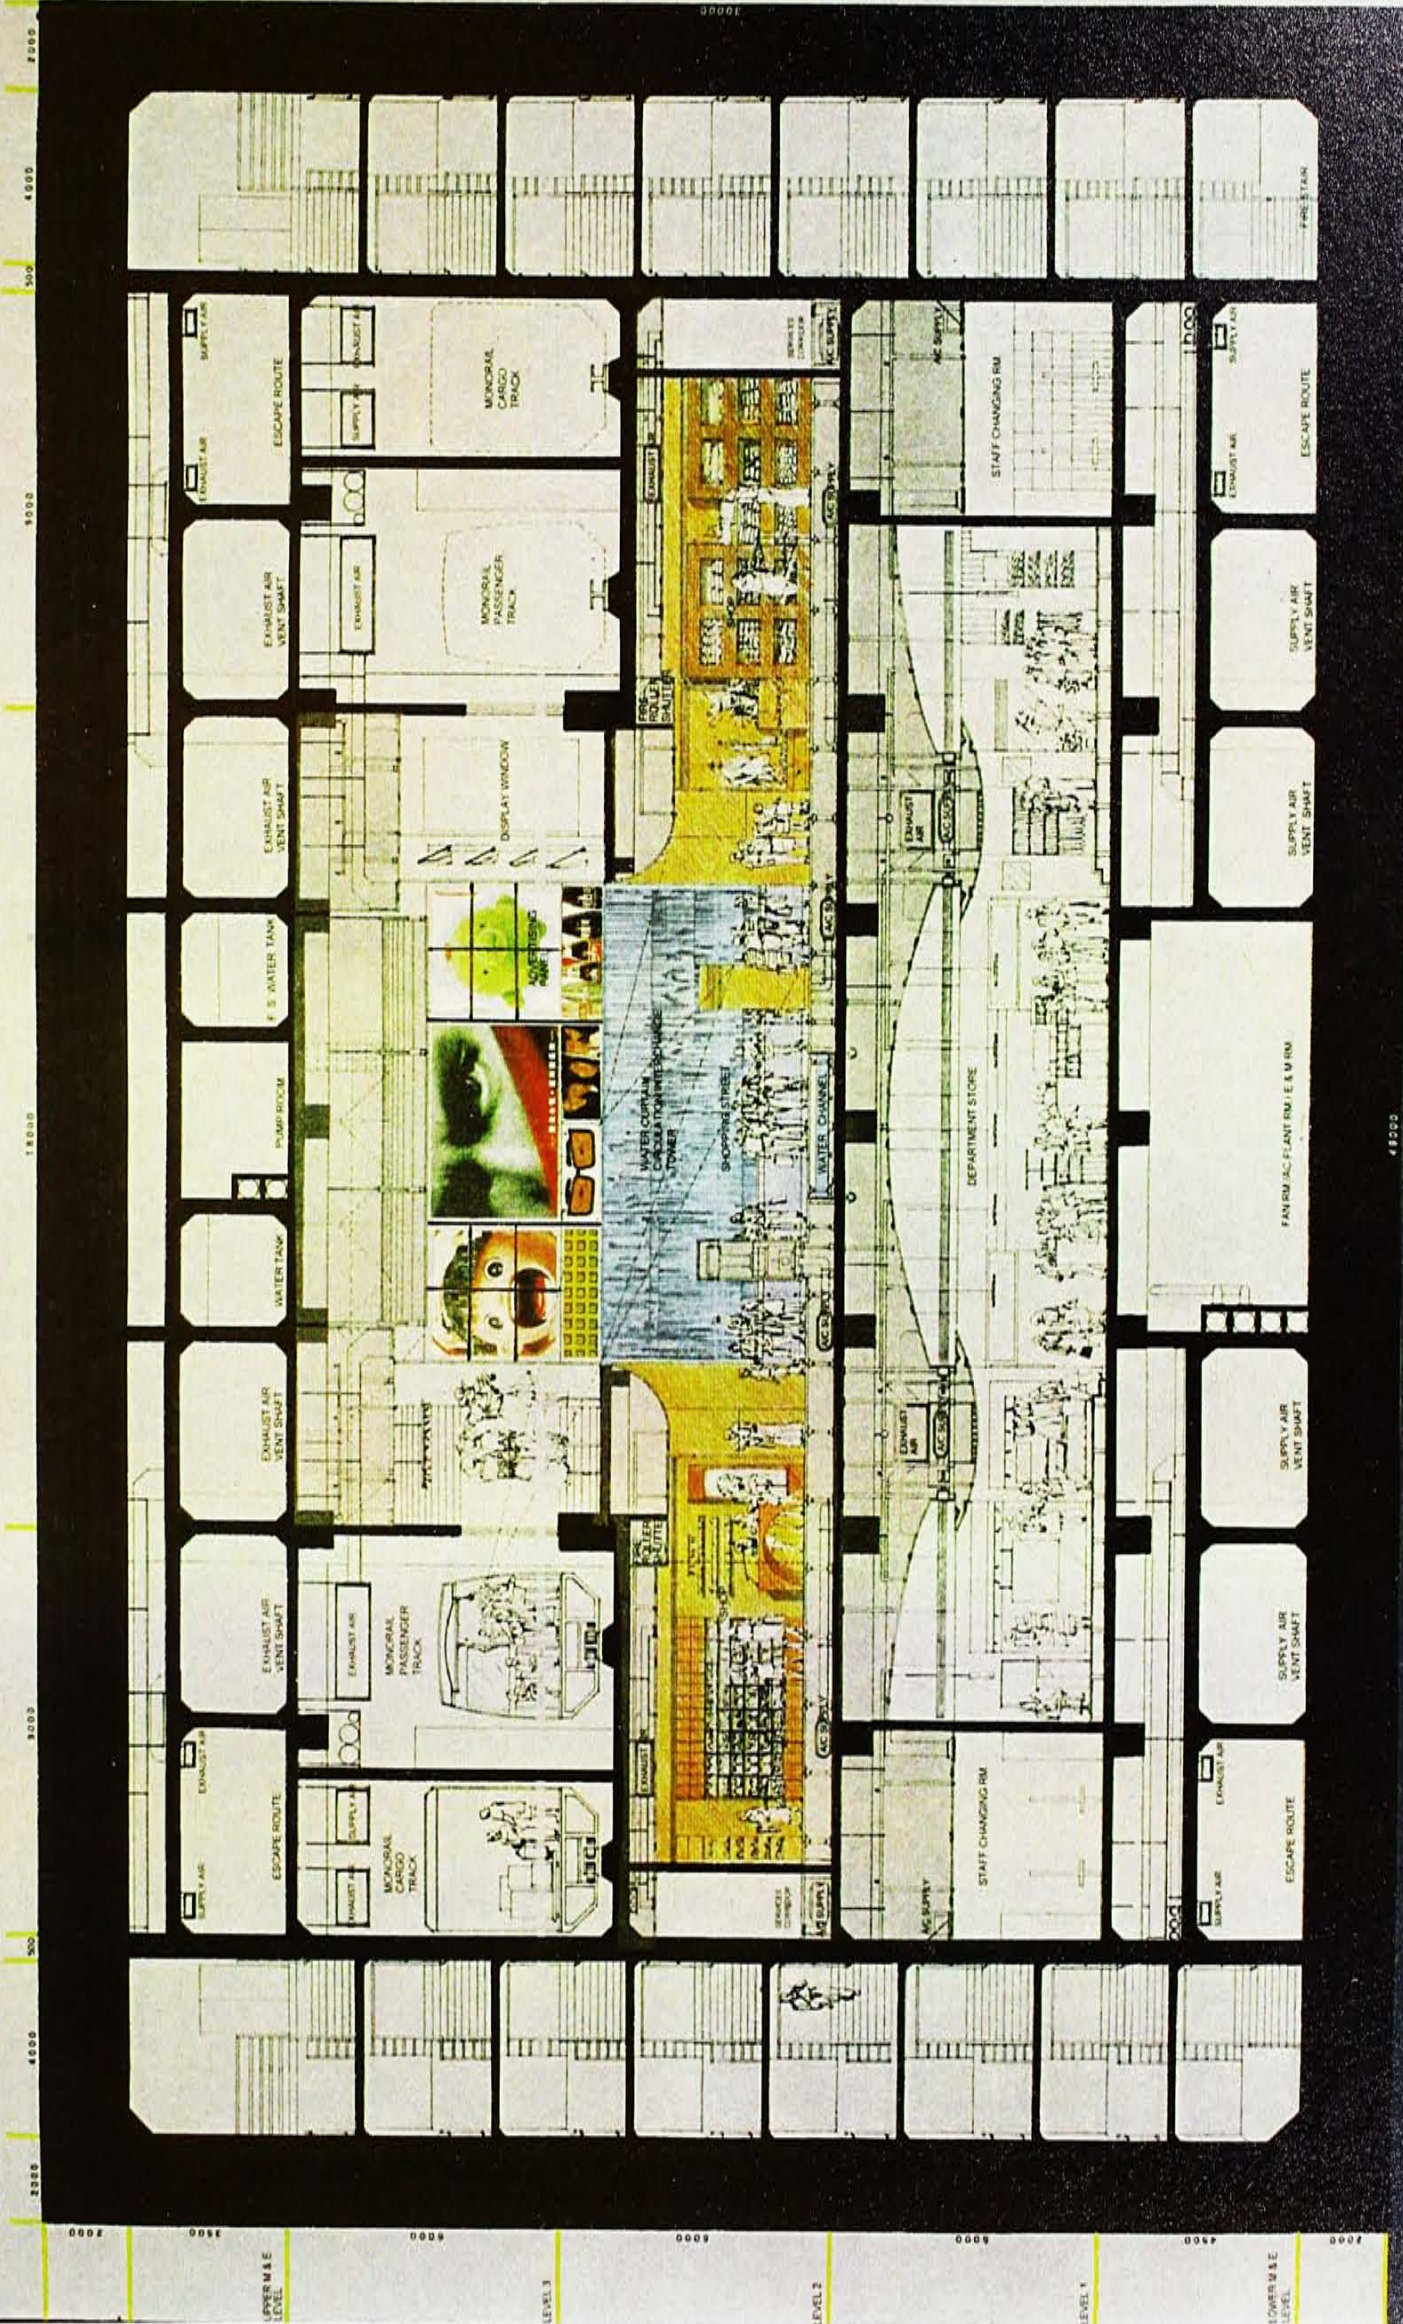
DETAIL PLAN OF CIRCULATION INTERCHANGE TOWER & SHOPPING STREET
